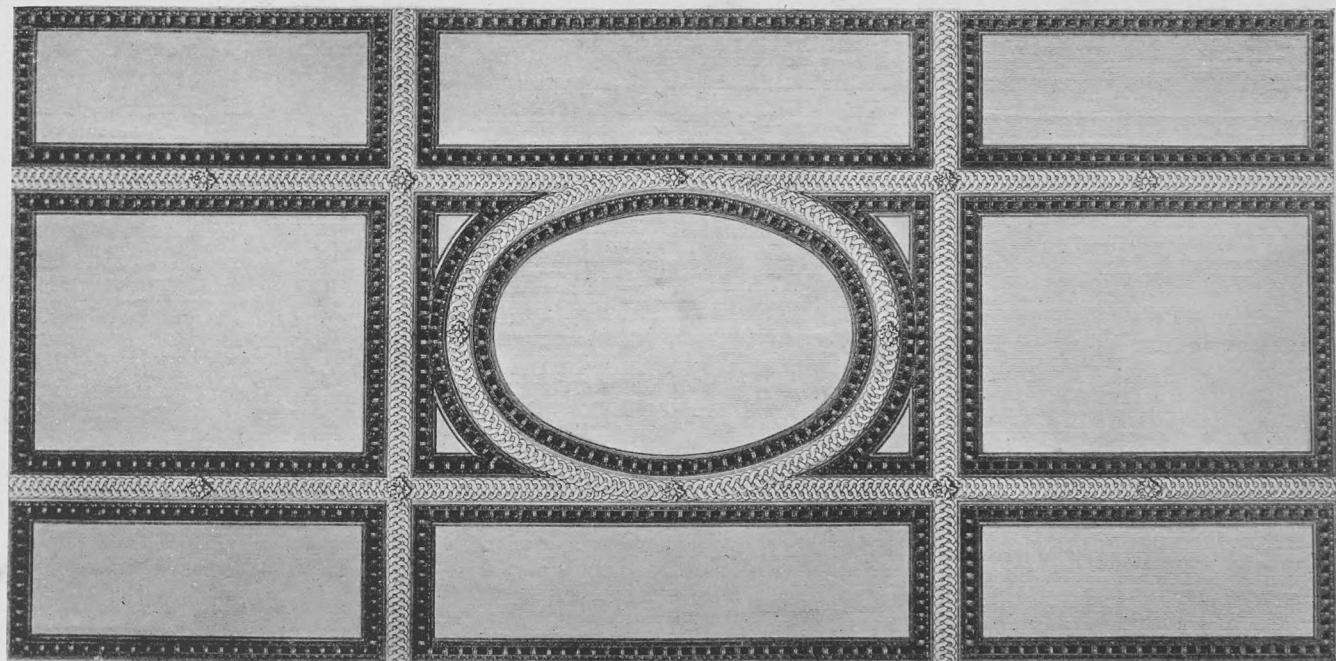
PLAN OF PLASTER CEILING in the Banqueting Hall, WHITEHALL, by INIGO JONES, completed 1622.
